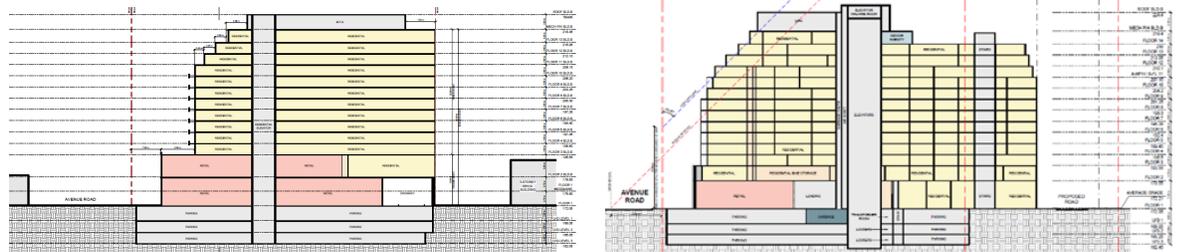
Plans and Sections in 2020 (left) and 2022 (right)
